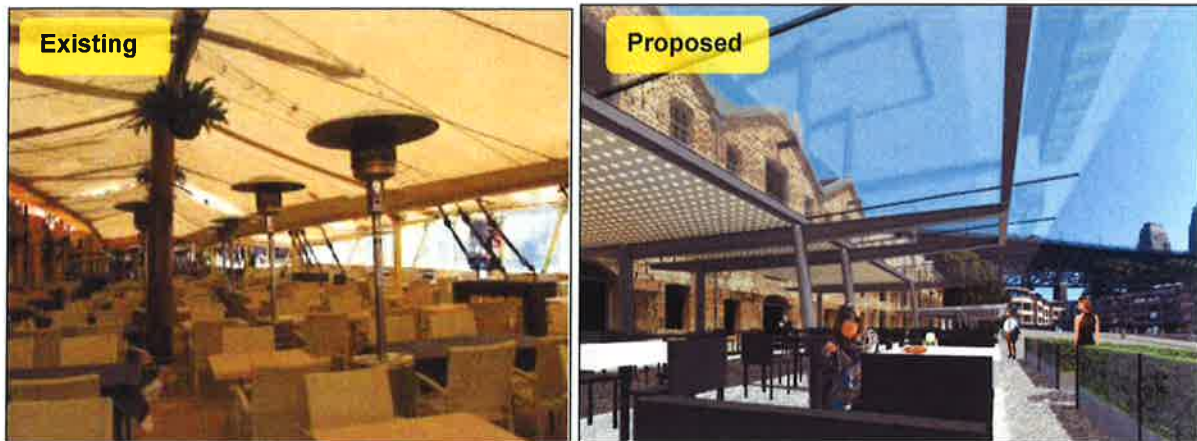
Views from the existing and proposed outdoor dining area (Source: Applicant's EIS).
